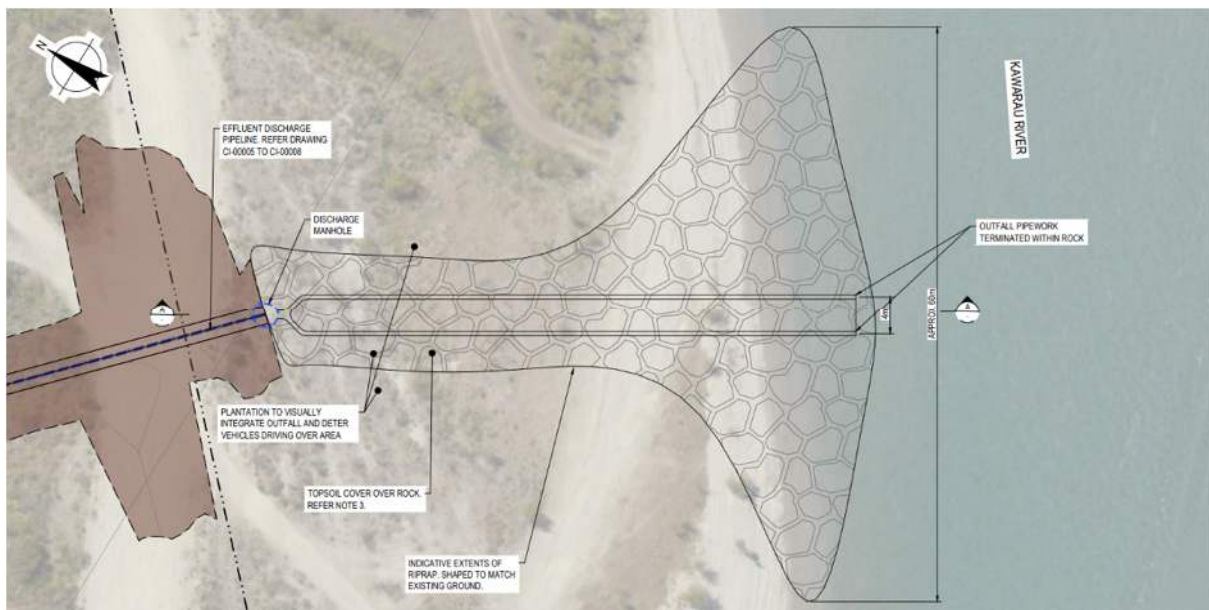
Indicative concept design for rock outfall, noting that this is subject to further detailed design (taken from GHD drawing CL-00013)
